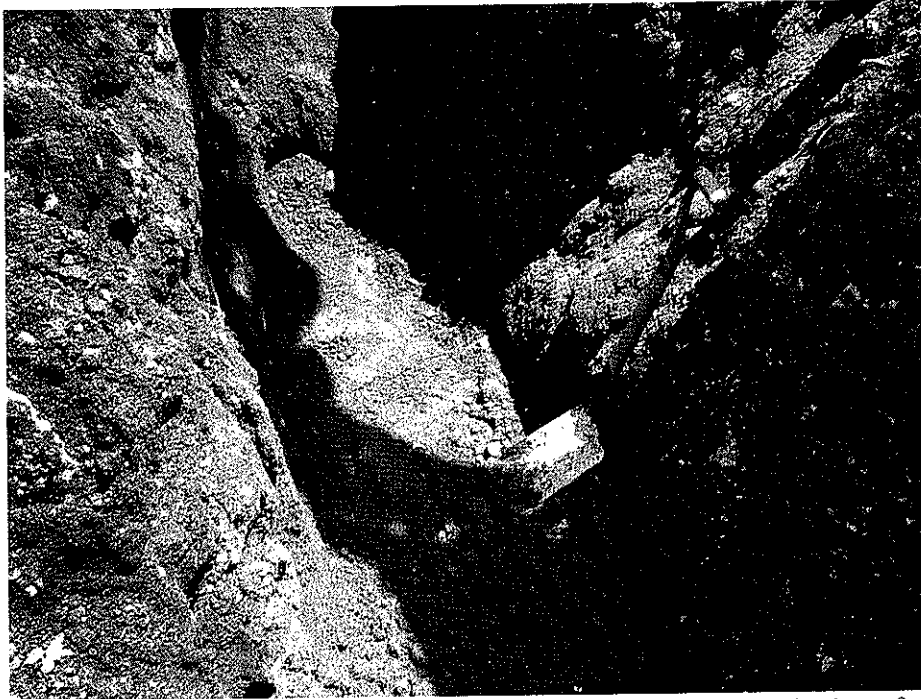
Varnoline Test Pit. Concrete Pad encountered at approximately three feet below surface grade with staining and odor.
